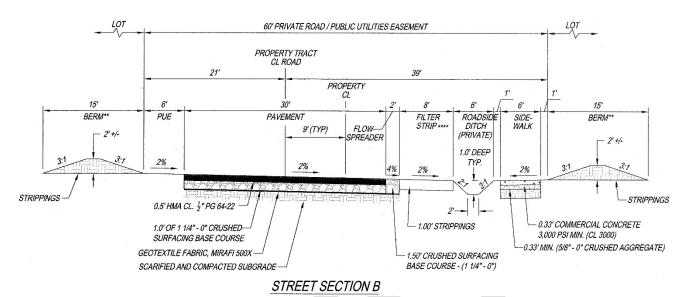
B. Street Section B: Water Quality Filter Strip with Private Road
